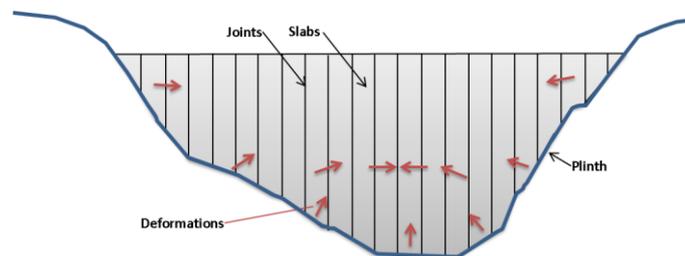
Face Slabs Dragged by the Rockfill Deformation.
